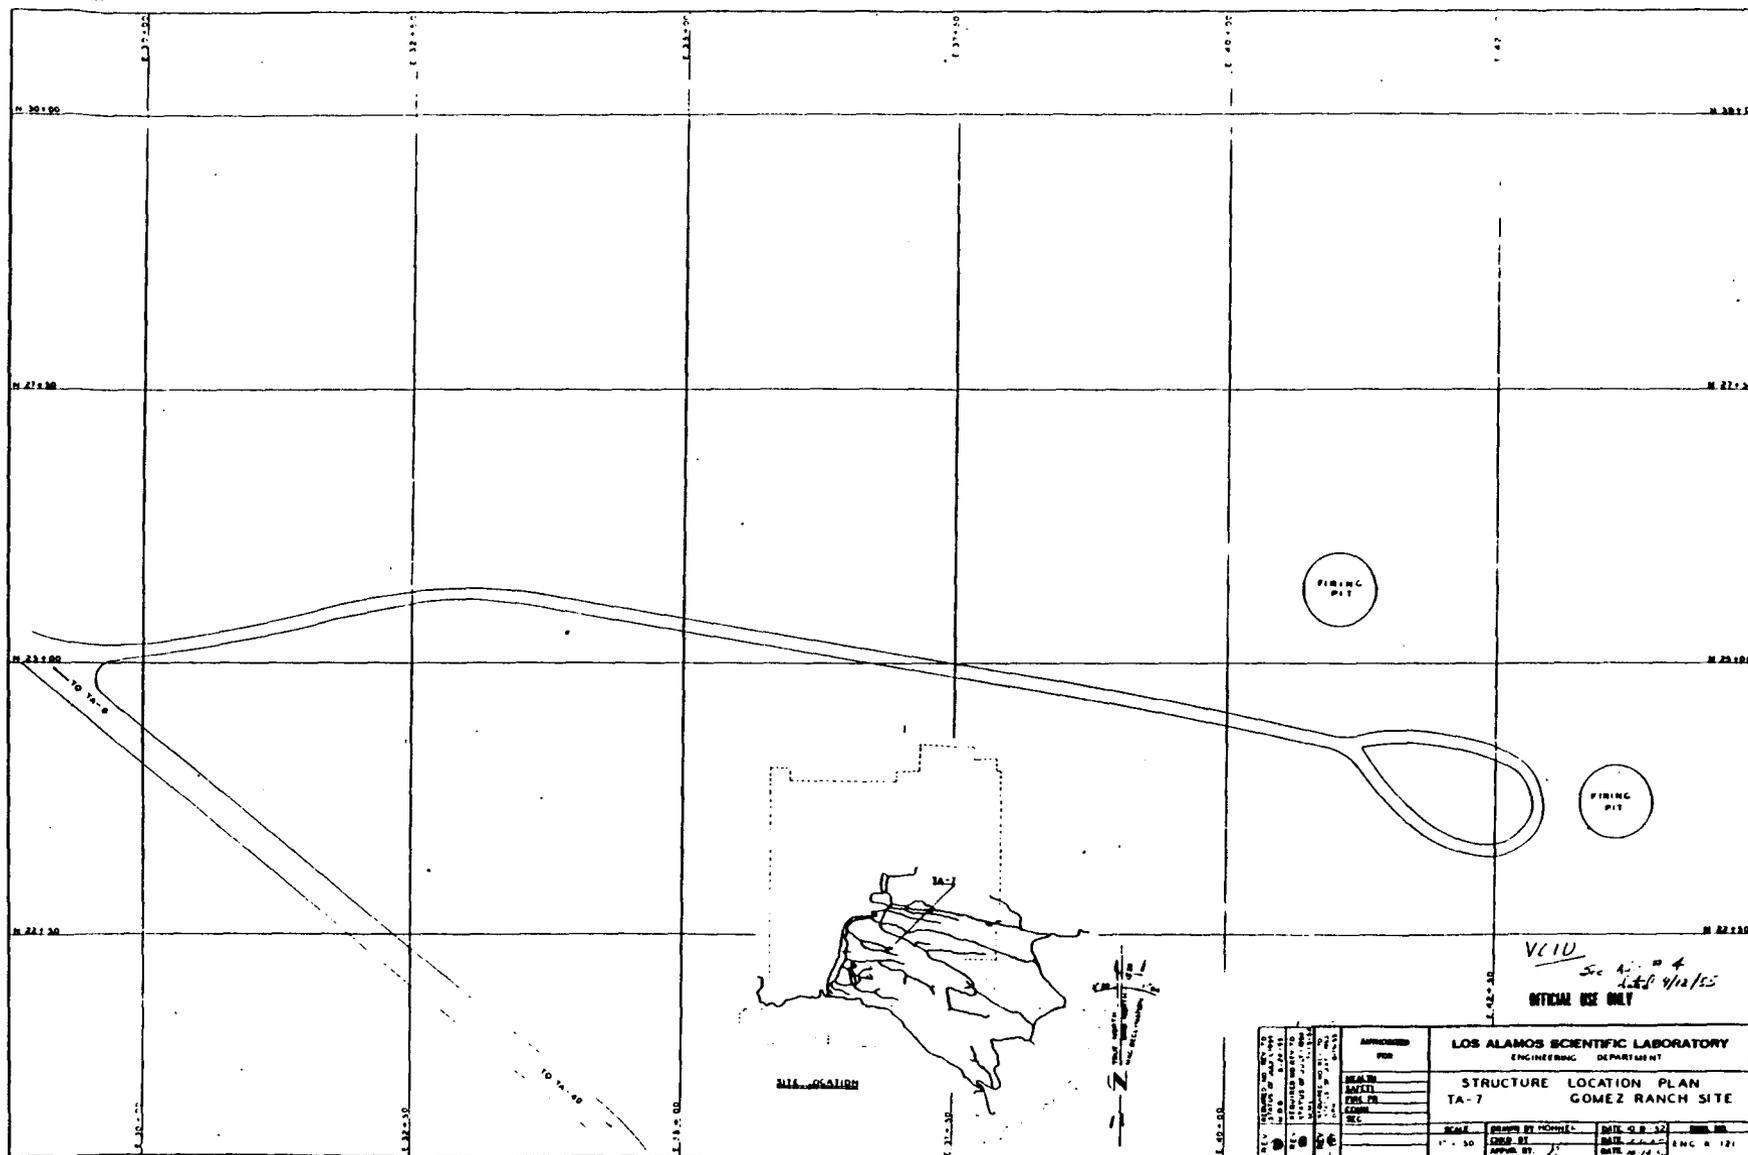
Structure Location Plan for TA-7 - Gomez Ranch Site (1952 Drawing from the LANL Technical Area Structure Location Plans)
